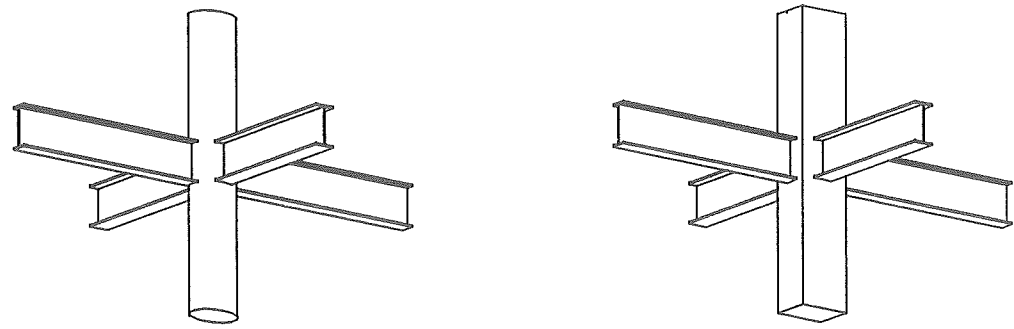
Semi-rigid welded beam-to-column connections
